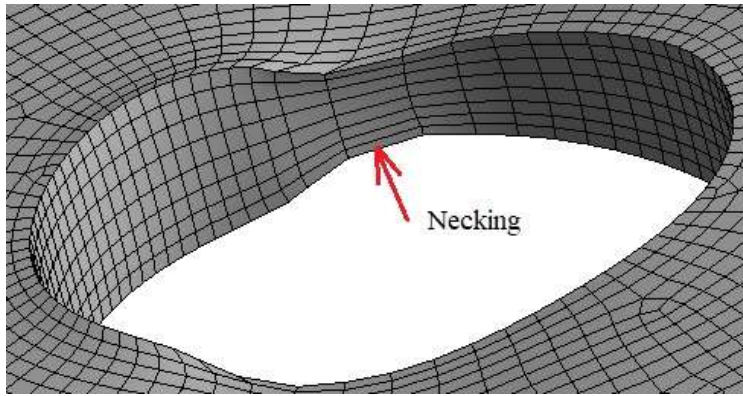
Deformed bolt hole, necking on a tension plane
